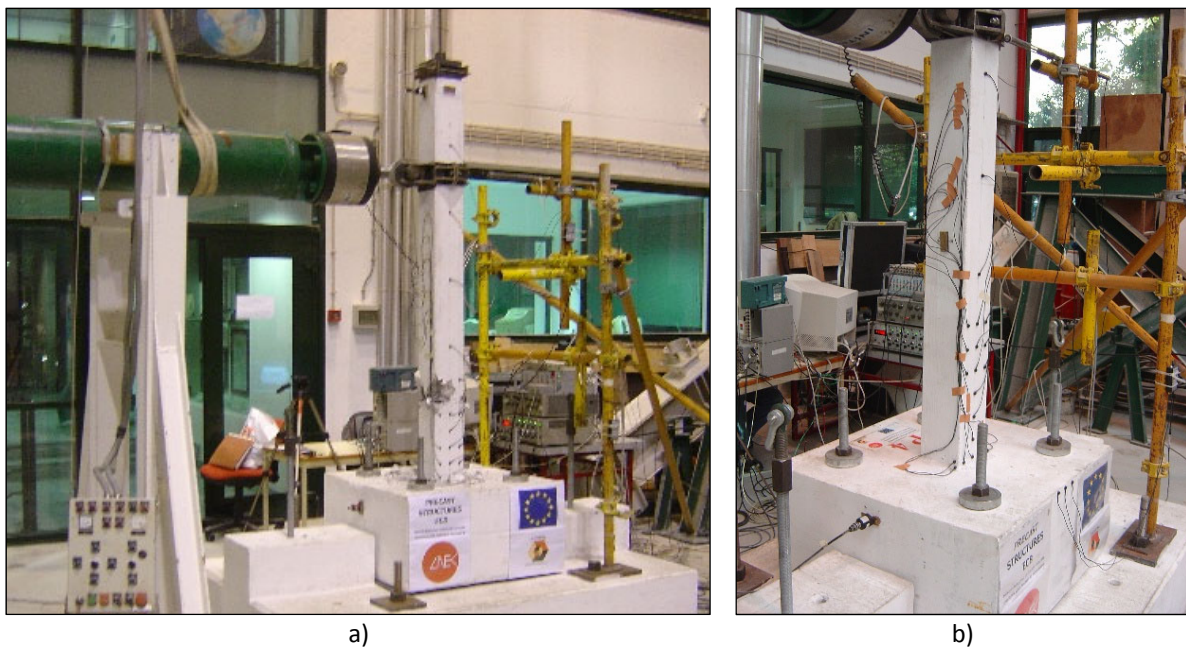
Example RC4 – General views of the test layout and instrumentation: a) Specimen P1; b) Specimen P4.
